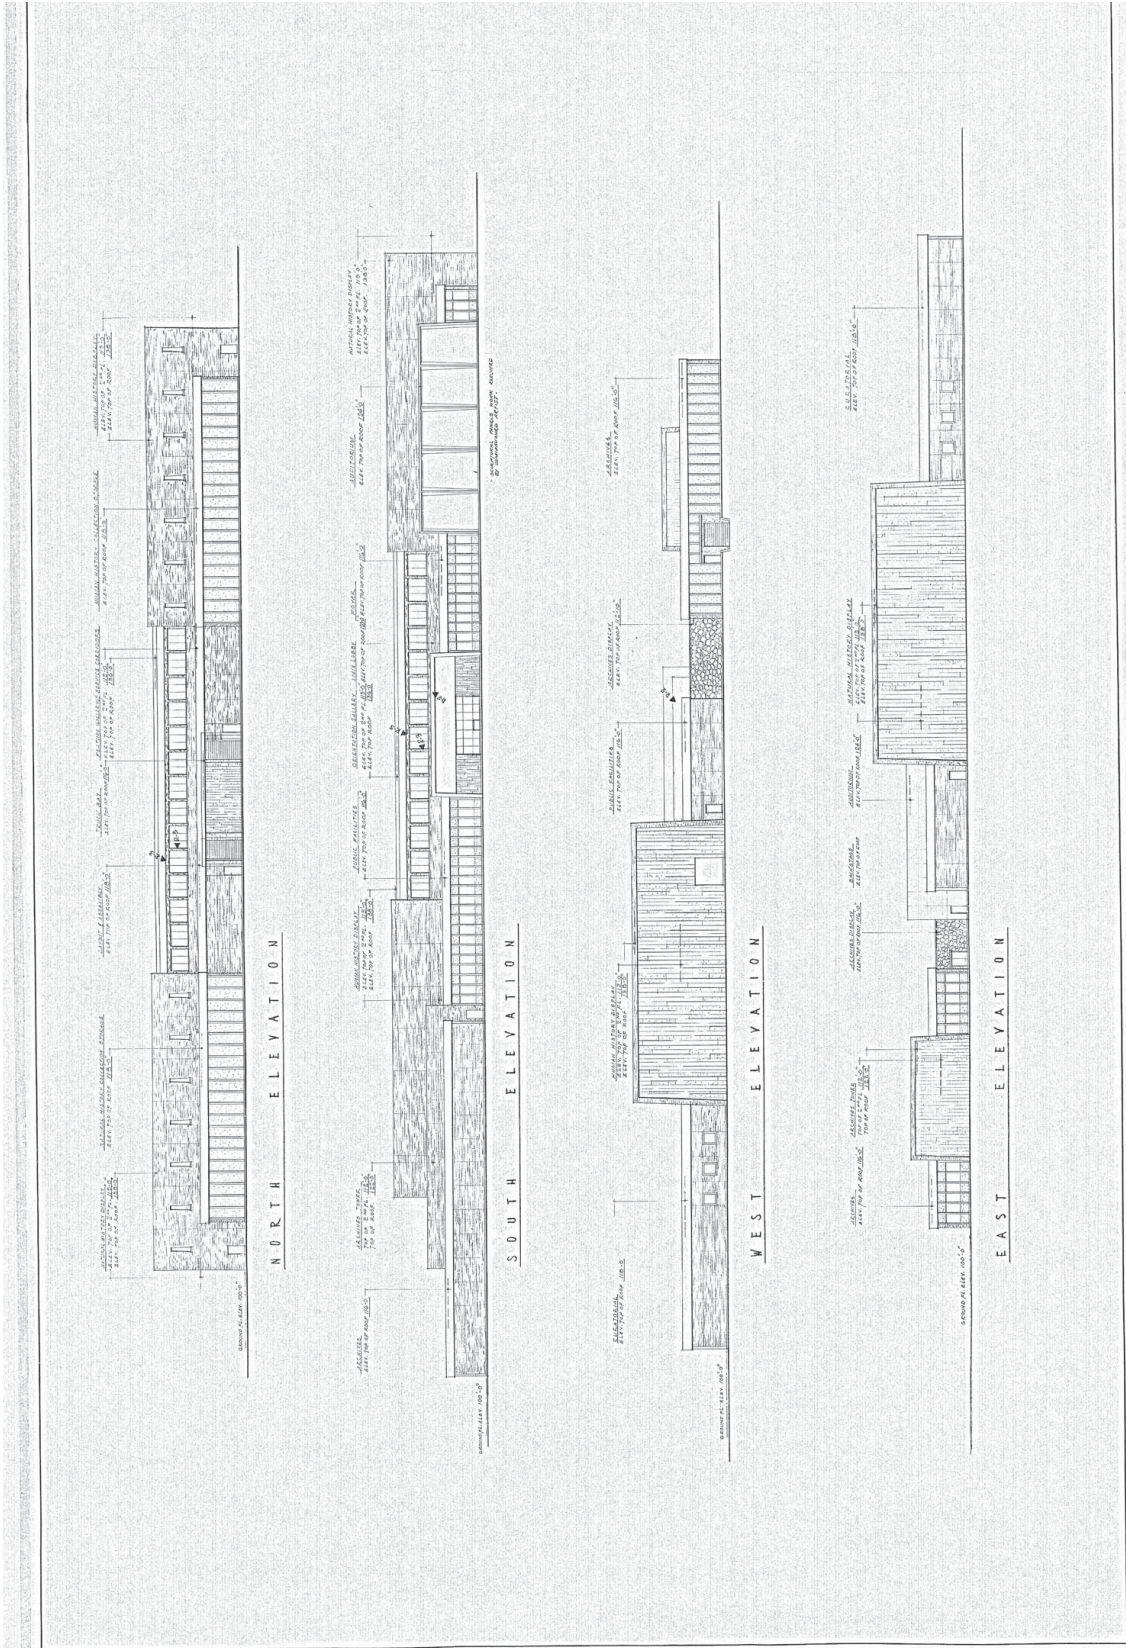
Original Alberta Public Works plans of the Provincial Museum and Archives; Building elevations from Alberta Infrastructure Technical Services Branch Archives
